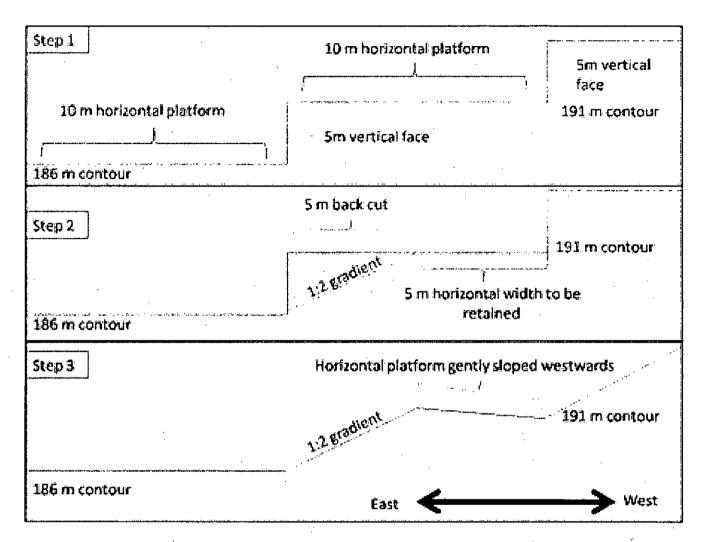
Bench development: Bench development will start at Step 1, cutting into the face and creating a 5 m high face. Step 2 will entail profiling the bench to create a 1:2 gradient. Step 3 will be the final profile at closure.
